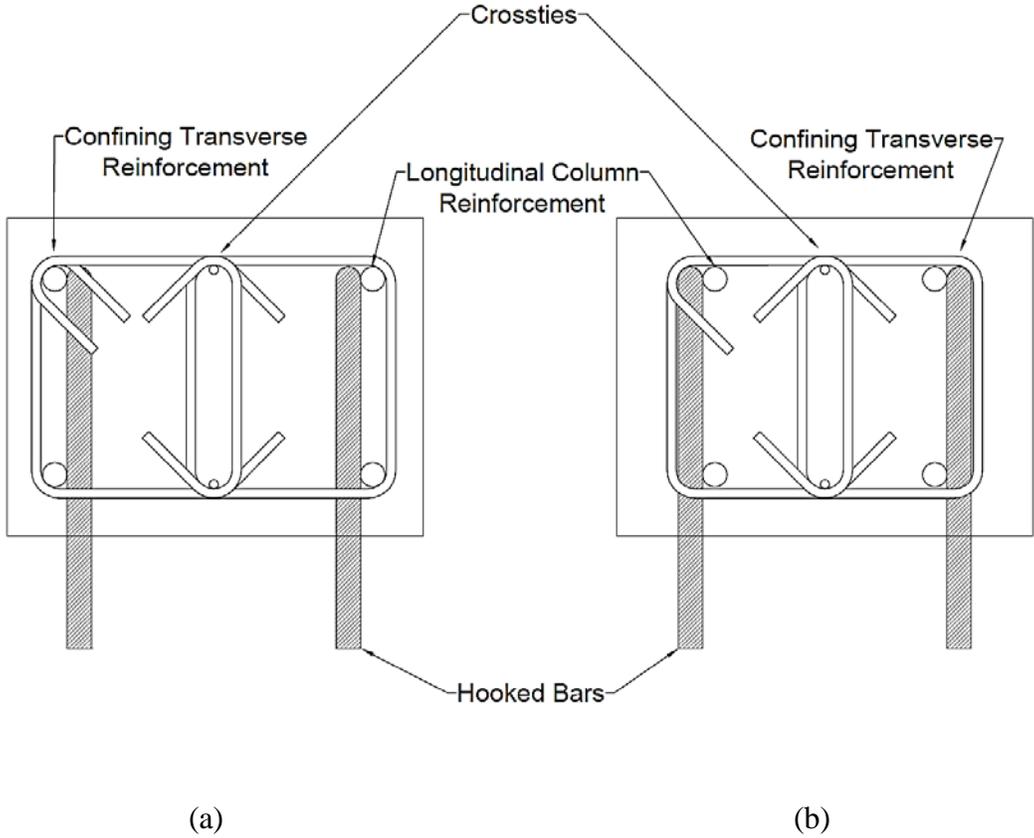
Cross section detail of specimens containing crossties with hooks placed (a) inside the column core, (b) outside the column core.
